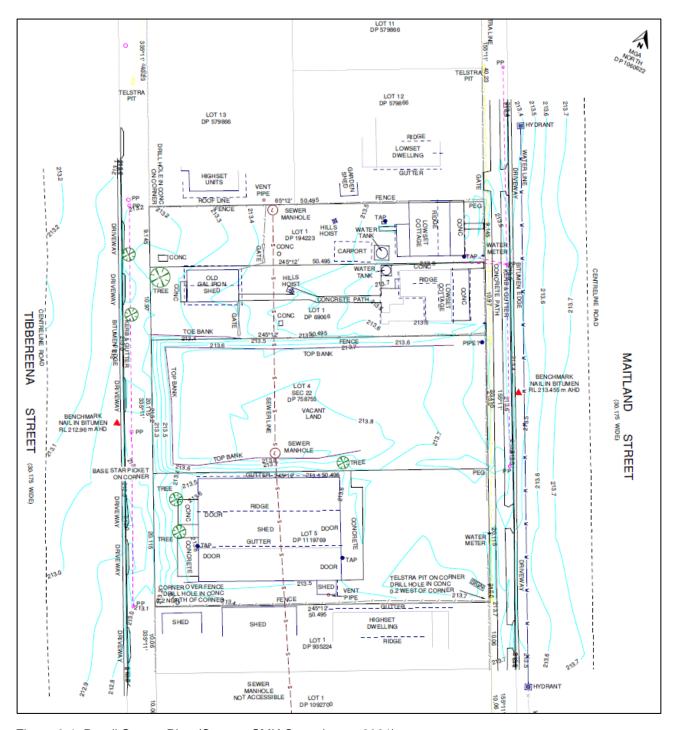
Detail Survey Plan (Source: SMK Consultants, 2021)
